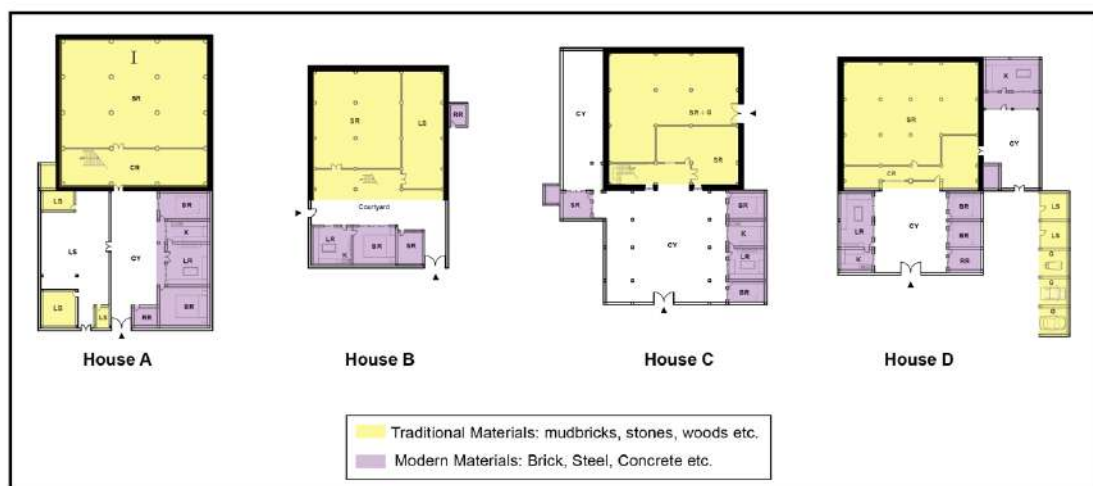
13. The building materials of four Tibetan dwellings <sup>86</sup>
